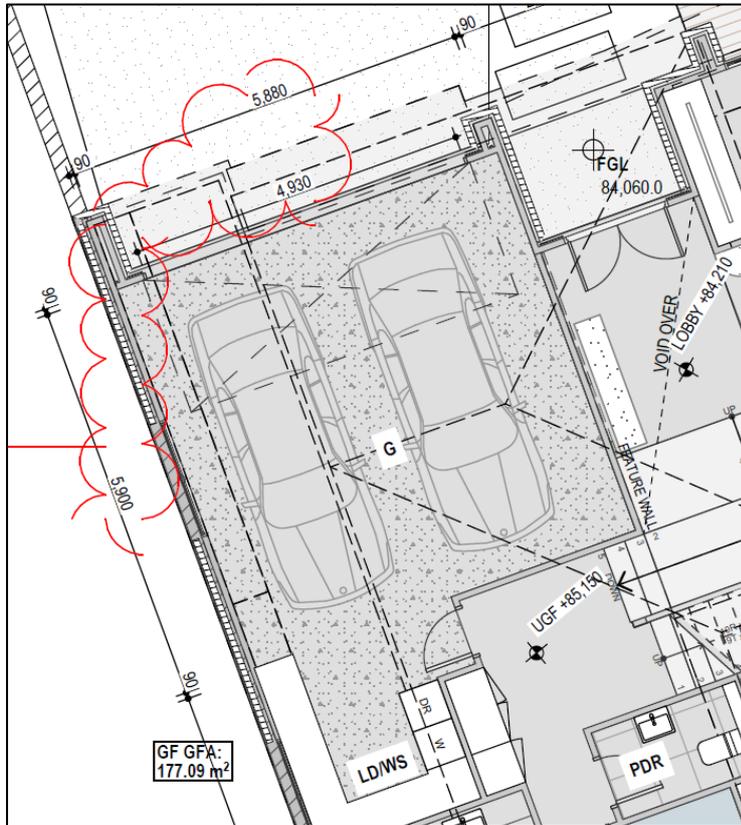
22 SUMMIT DRIVE - GARAGE DOOR DIMENSIONS
